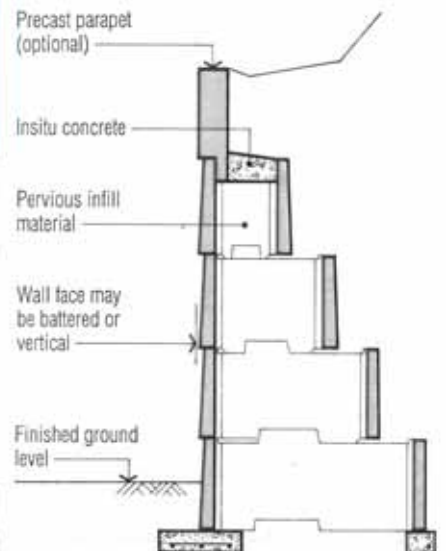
DOUBLEWALL TYPICAL SECTION
